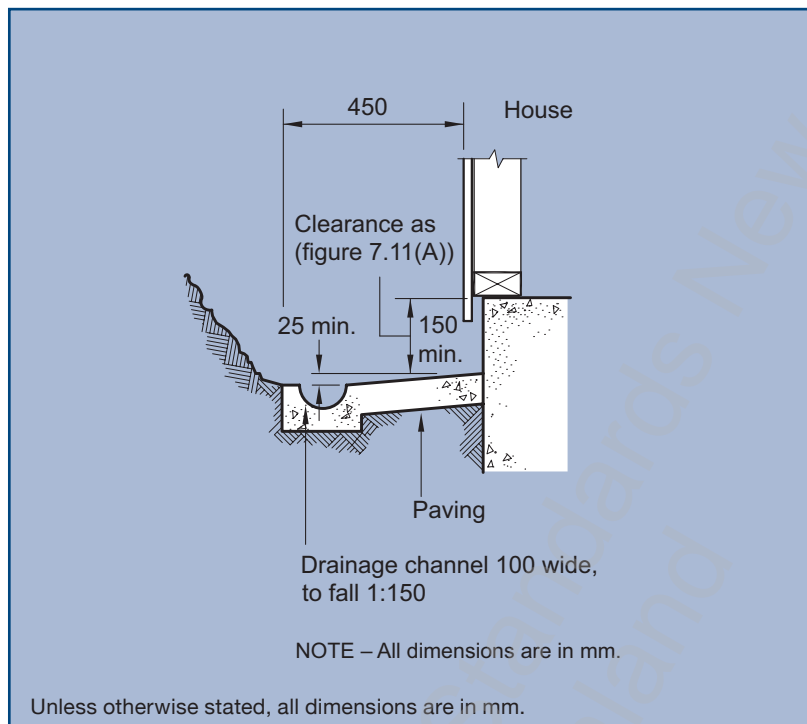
Provision of permanent paving adjoining buildings with concrete slab-on-ground floors (see 7.5.2.2)
